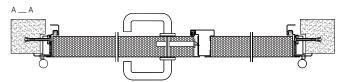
Horizontal cross-section of the ECO double-leaf solid seamless steel door with a frame at the door lock level
